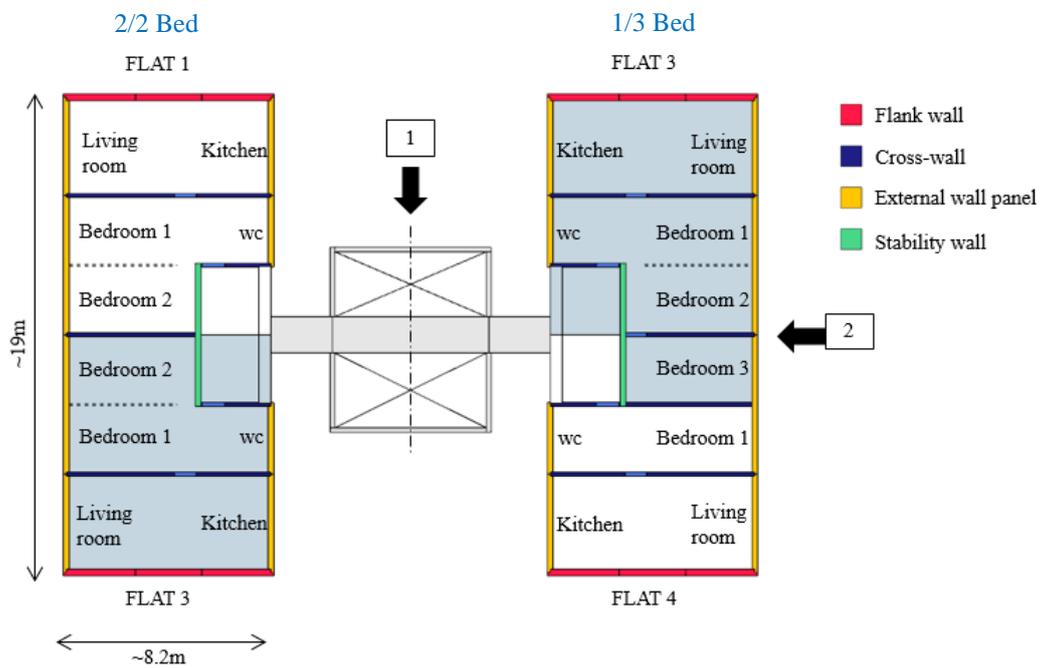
Approximate floorplan of the Ledbury Estate tower blocks. For illustrative purposes a one and three bedroom flat layout is shown on the same floor as a two-bedroom flat layout.
